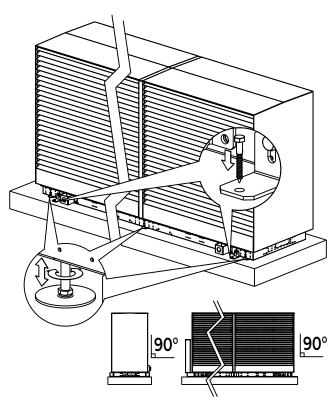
ADAPT MAX 10070-10140 – Installation on the foundation and leveling.
